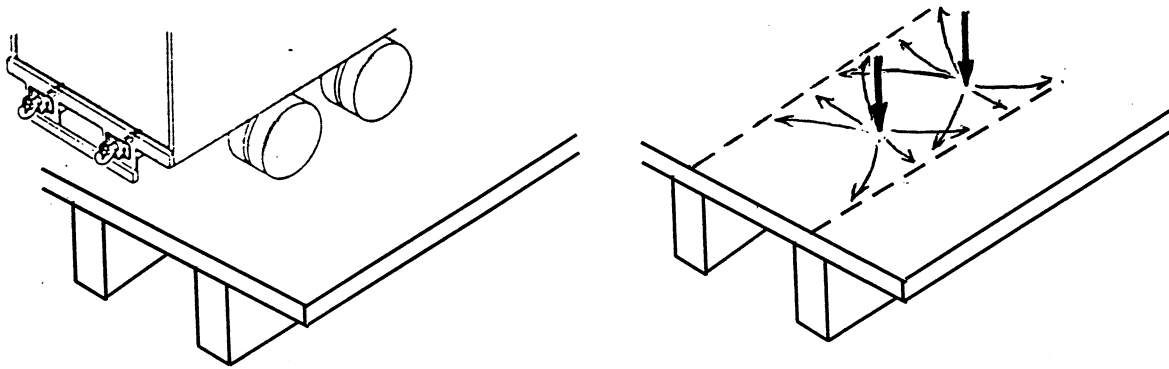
Lateral Load Transfer of a Typical Stringer/Deck System
